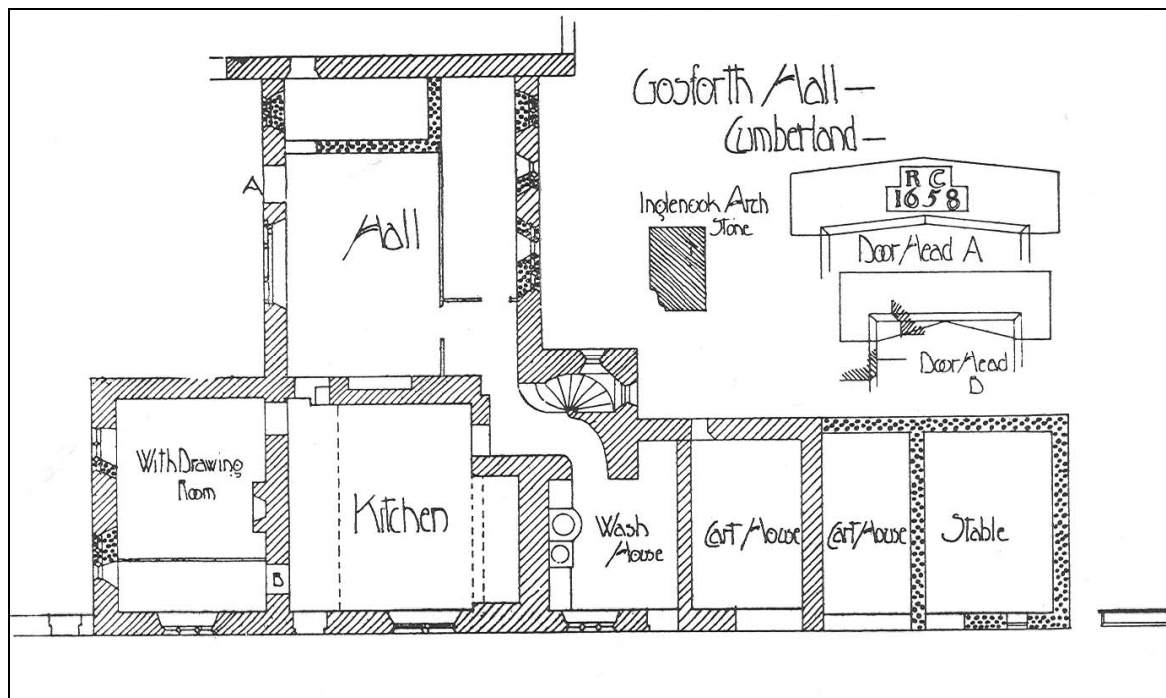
Ground Plan of Gosforth Hall (After Curwen 1903)
